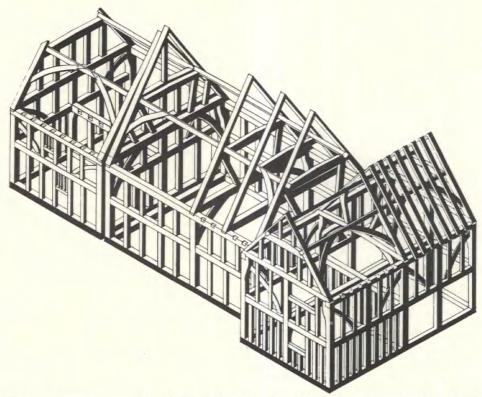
Composite isometric view of the timber-framed building at Lower Roxhill Farm, Marston Moretaine, looking from east.
